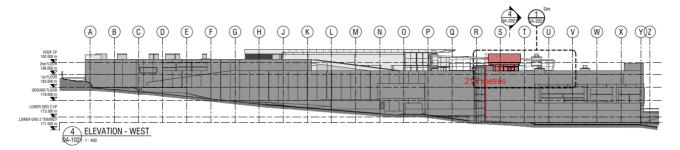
Building height breach as viewed at the western elevation (shaded red).
